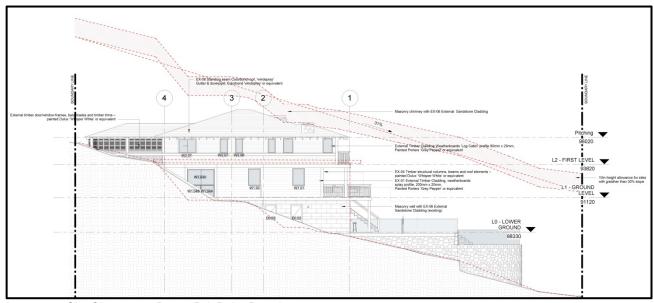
Site Slope - 44 Bynya Rd, Palm Beach
